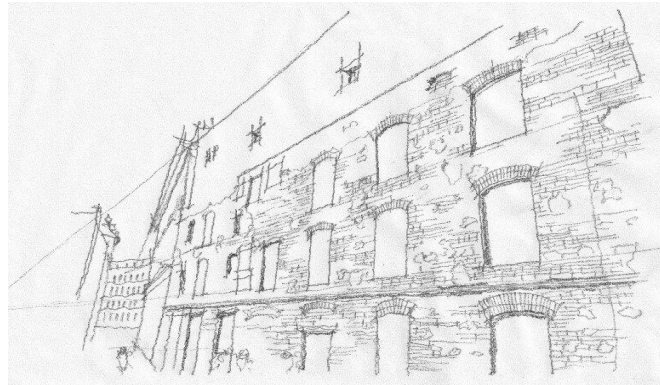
Reconstruction of the Slovak National Gallery in Bratislava, original Baroque masonry stripped of plaster, reflecting its construction history and inputs by BKPŠ.
